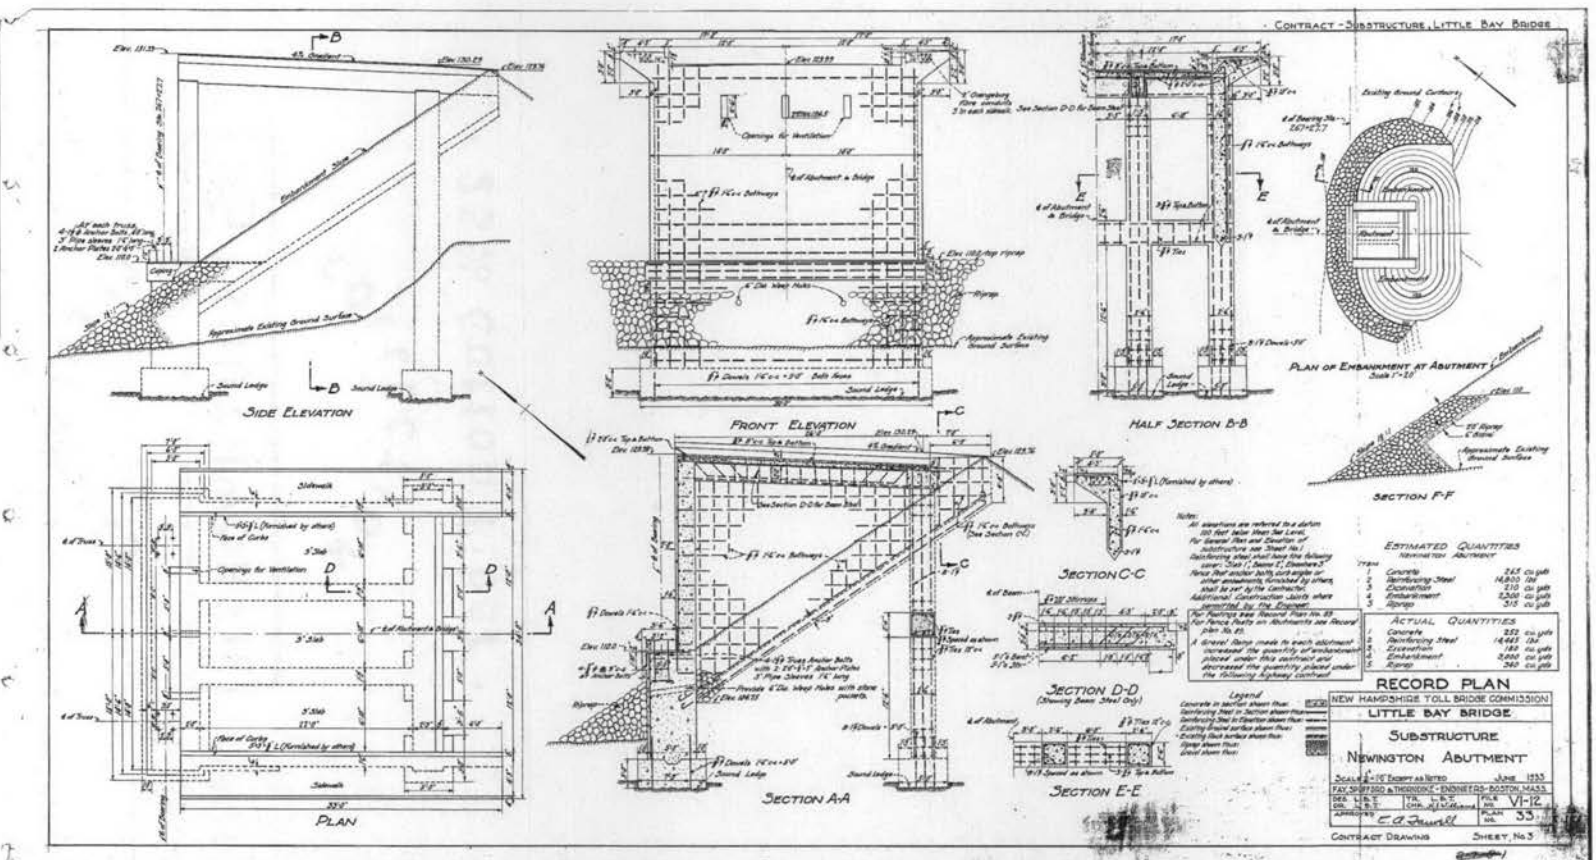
Record Plans, Substructure, Newington Abutment, VI-12-23
